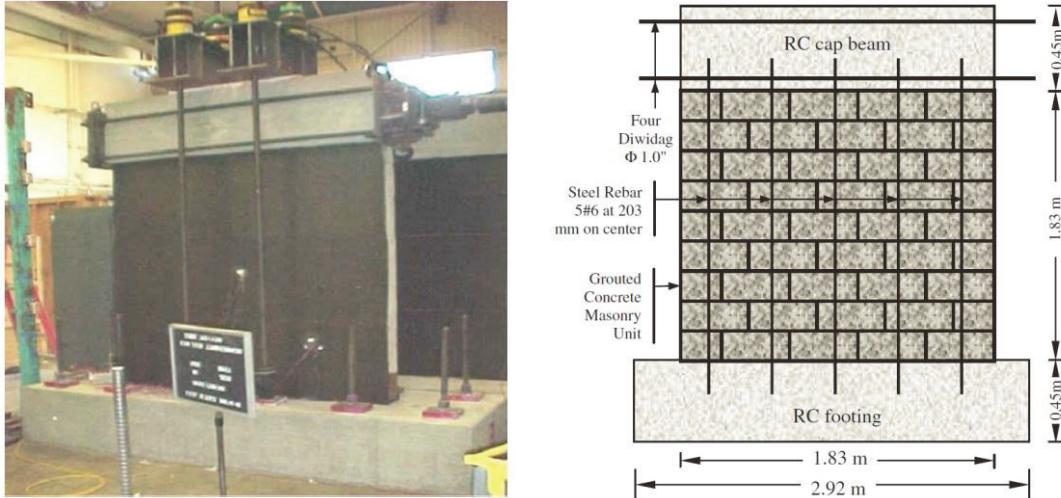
In-plane shear test setup for masonry walls with top RC loading beam (Mosallam and Banerjee, 2011)
